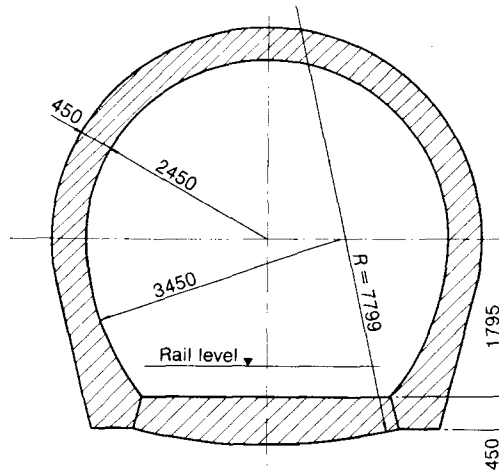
In situ concrete lining, 4.9 m i.d. (dimensions in millimetres)
